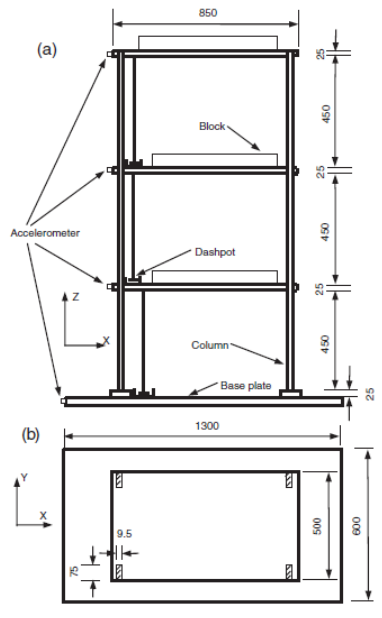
A three-storey steel model used in Zhu et al. (2011) for experimental shaking table tests (a) side elevation (b) plan elevation. (all dimensions in mm)
